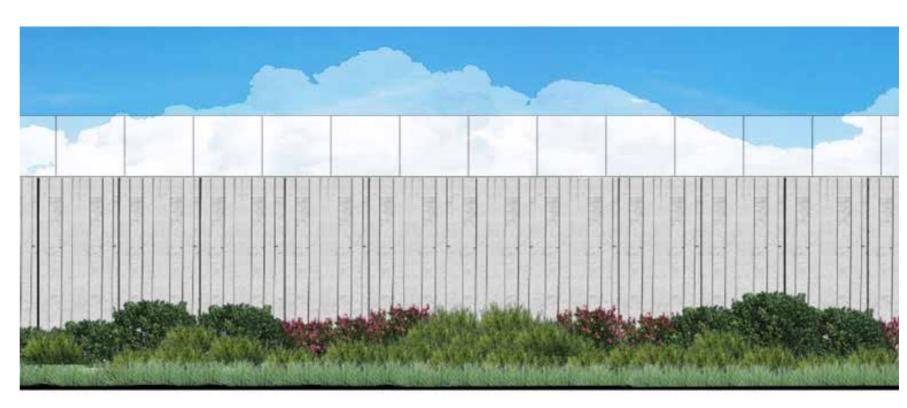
TYPICAL ELEVATION TRANSPARENT CLEAR PANEL ABOVE SOLID WALL
